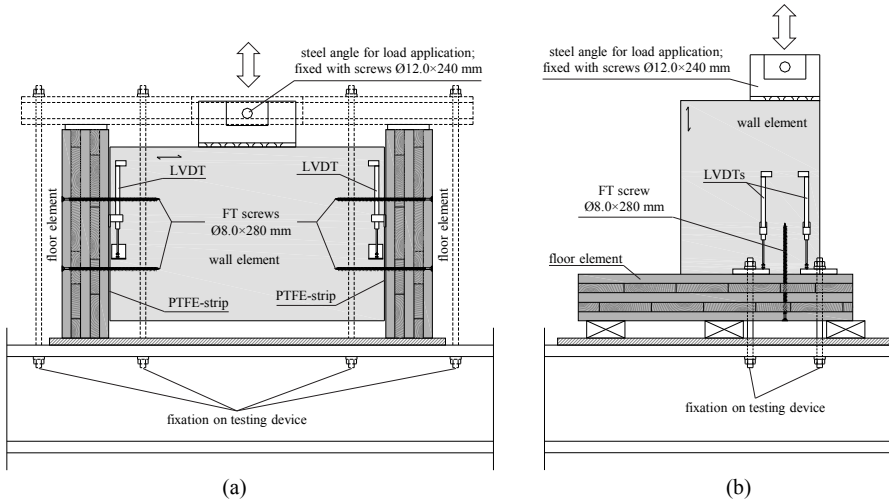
screws applied in a wall-to-floor joint – (a) test configuration for shear loads; (b) test configuration for tension loads
